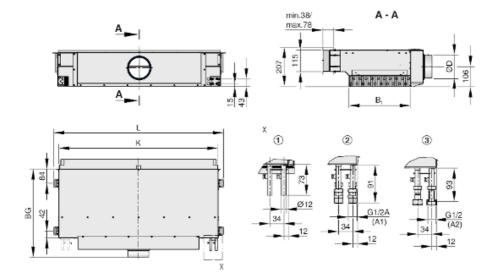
Dimension drawing DID-E2 with supply air spigot (-Z) and without volume flow controller, DID-E2-4 shown
